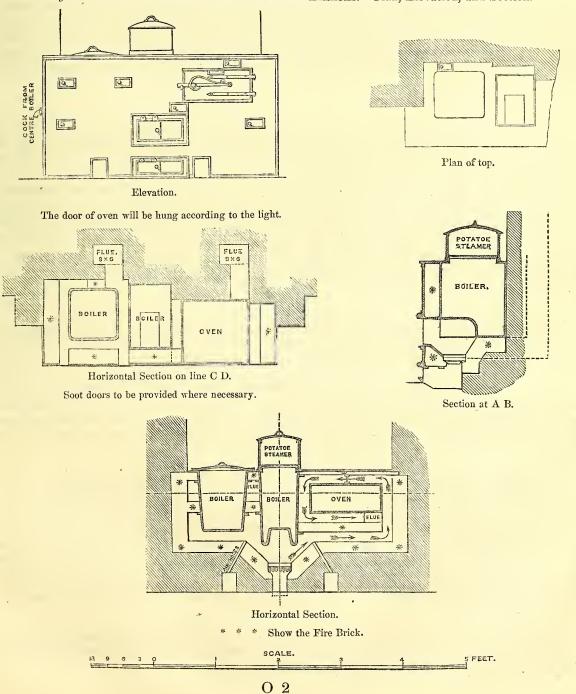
COOKING APPARATUS FOR SMALL BARRACKS.—Plan, Elevation, and Section.
